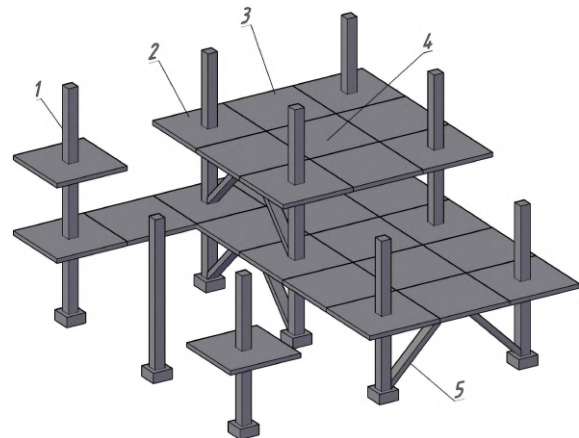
One of the new buildings of precast flat plate frame structural system in Poltava.
